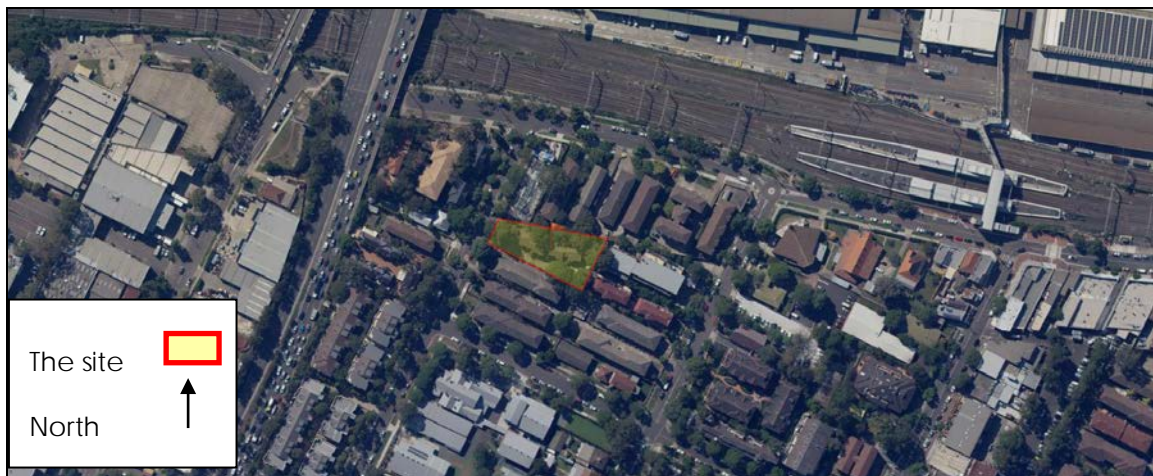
Aerial view of the site (Source: Six Maps 18/4/2020)
